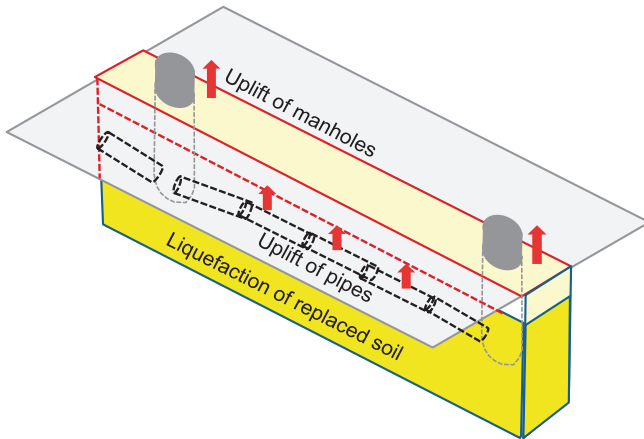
Damage to sewage pipes and manholes due to the liquefaction of replaced soils
